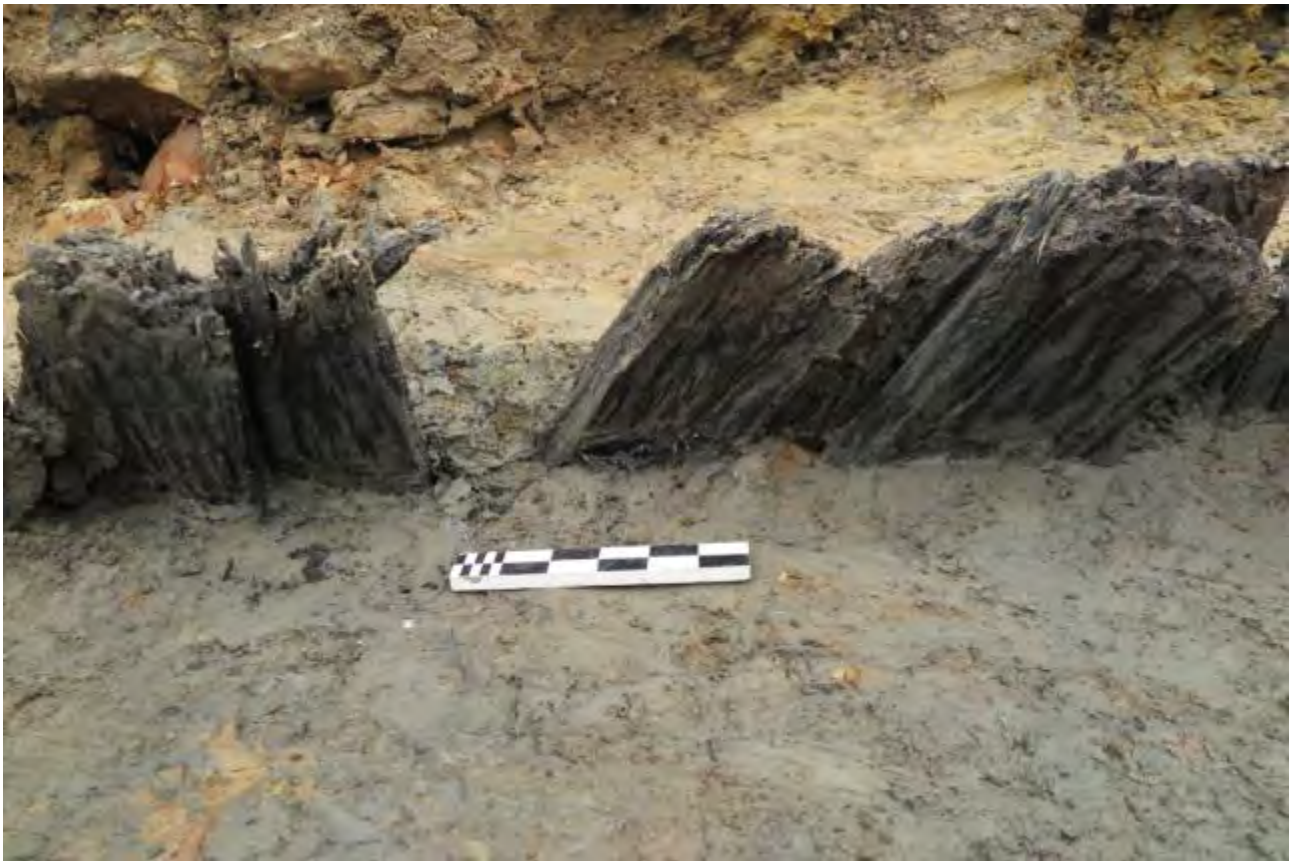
Timber shoring beside the drain within the creek line (Casey & Lowe photo)
